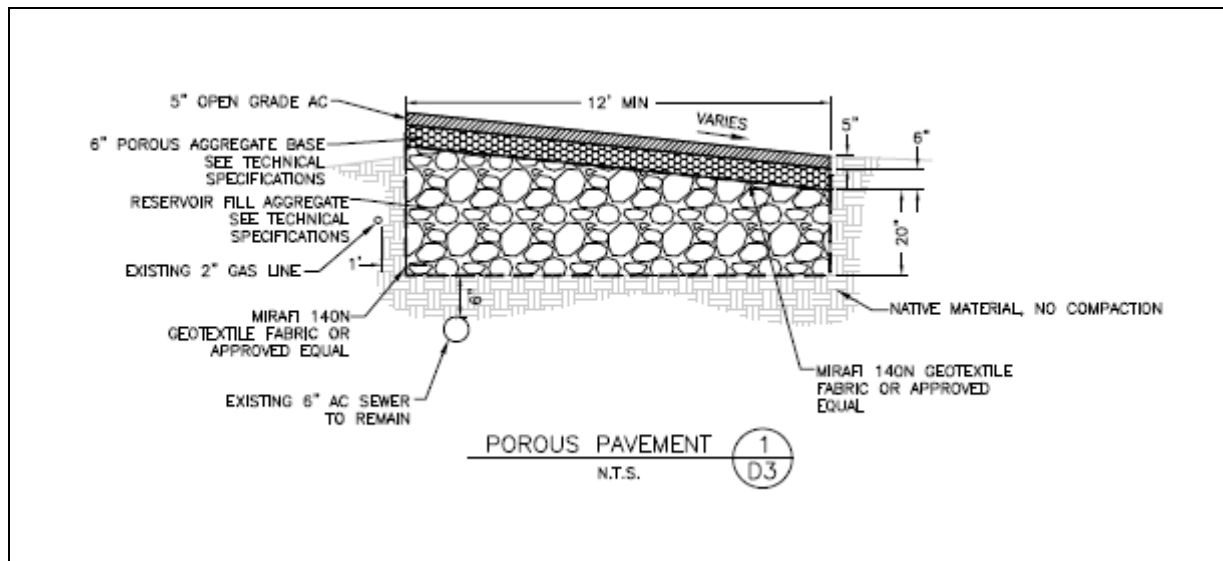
Porous Pavement Cross Section Detail from Nichols Consulting Engineers
